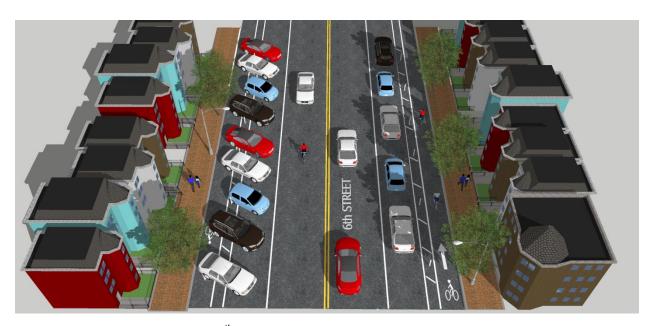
Proposed Diagonal Parking on $6^{\rm th}$ Street under Alternative 2
